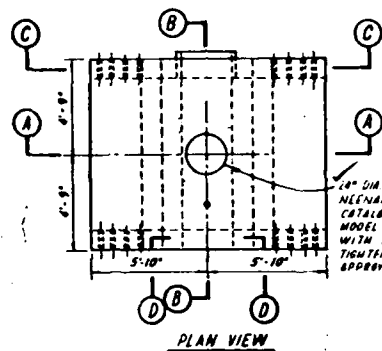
DETAILS OF REINFORCED CONCRETE ANTI-SEEP COLLAR
